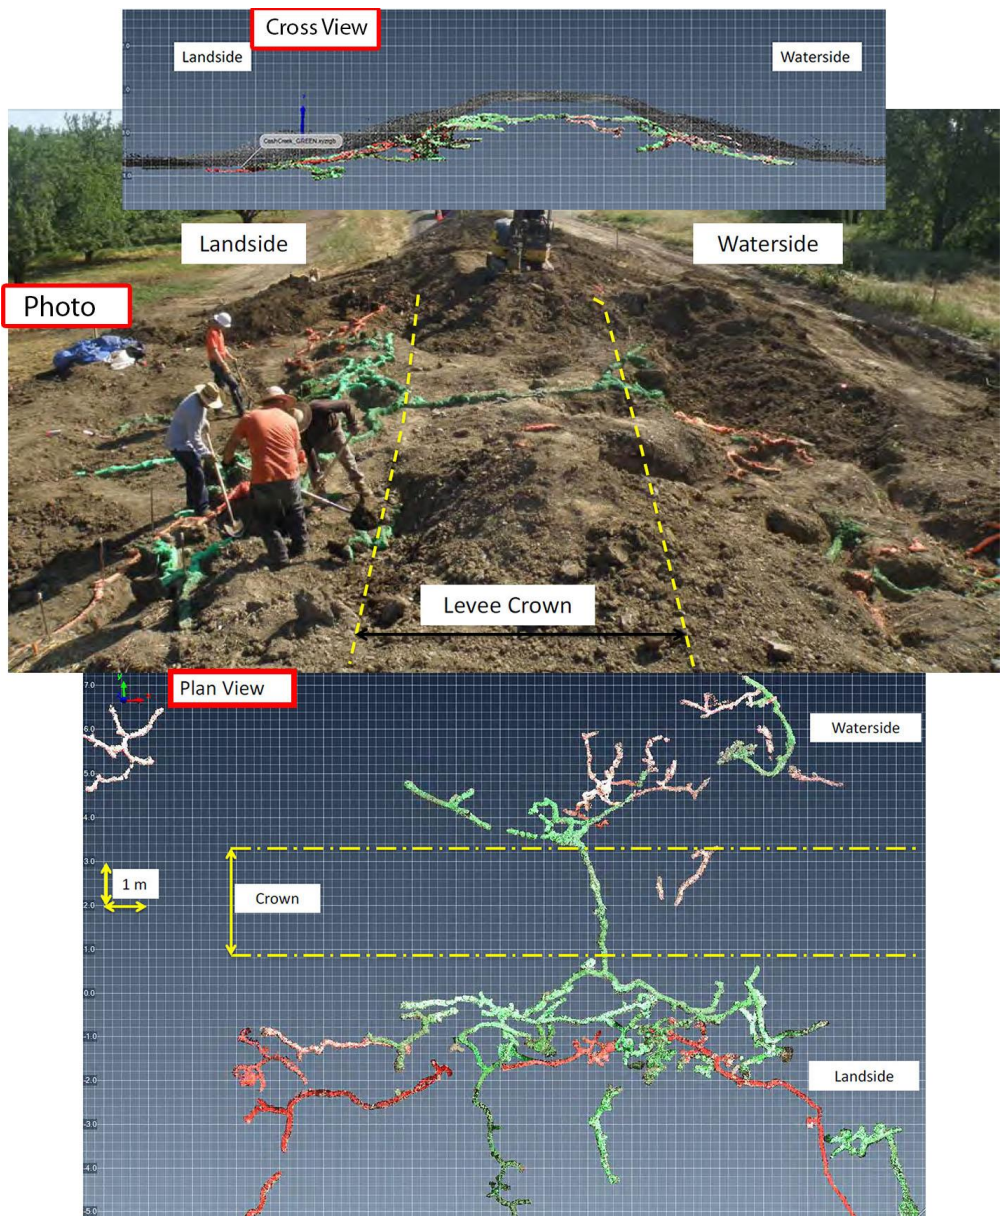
Cross section view, plan view and a view of completely penetrating burrow in the levee [adapted from Roa et al., 2014]
